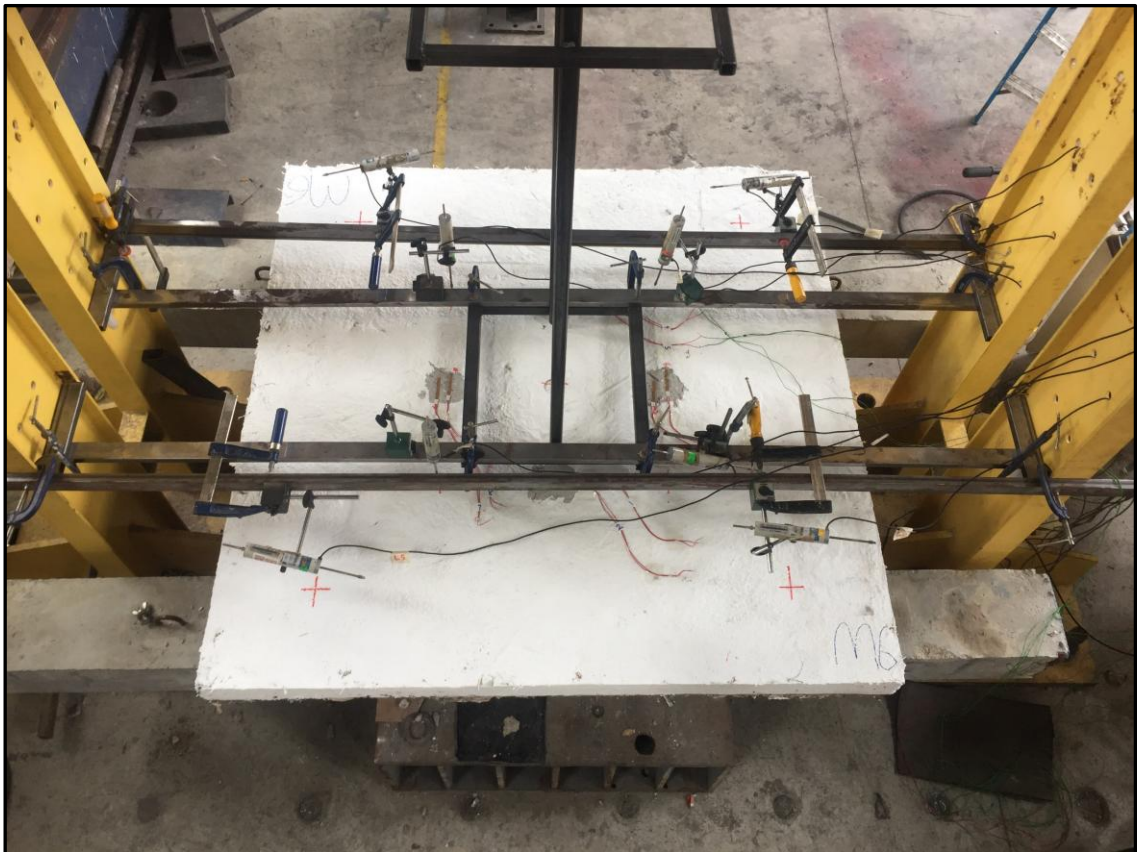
Final Crack Patterns for Impact Test Specimen M6
